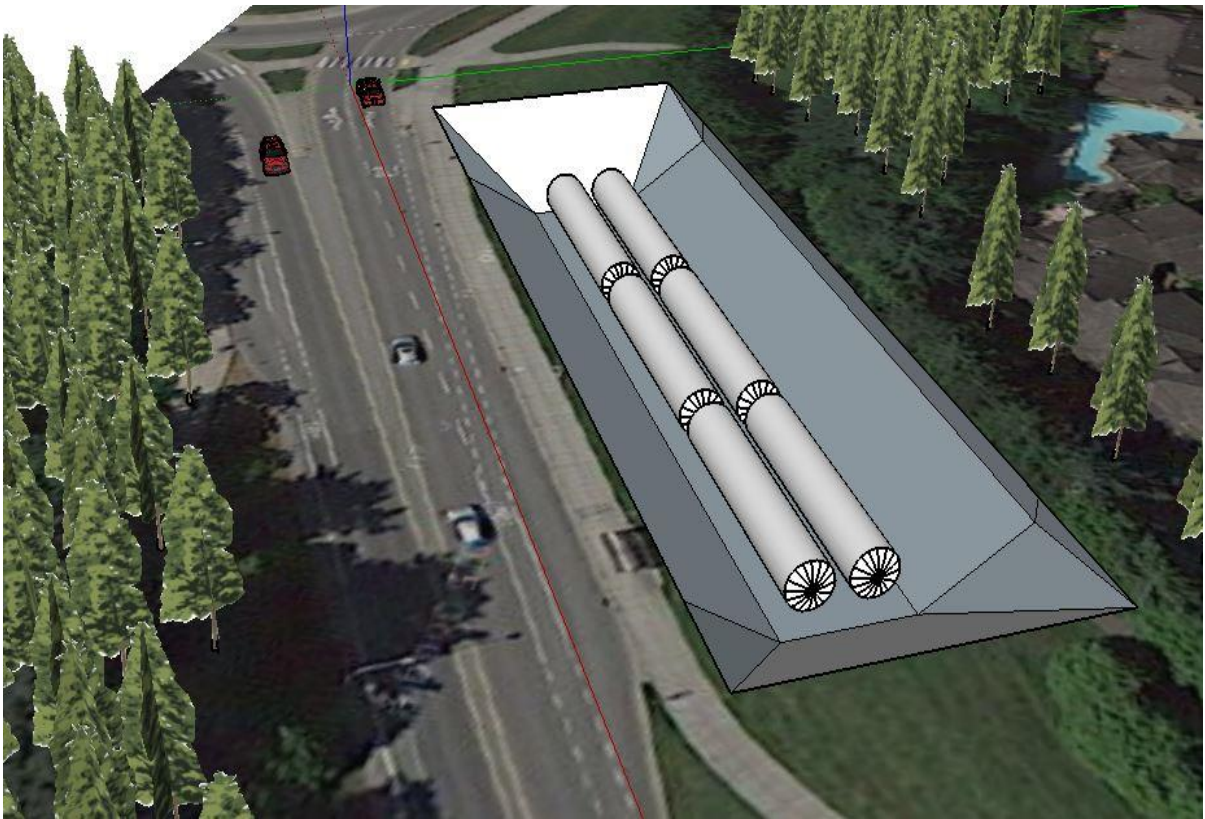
Overview of Cylindrical Fiberglass Tanks
